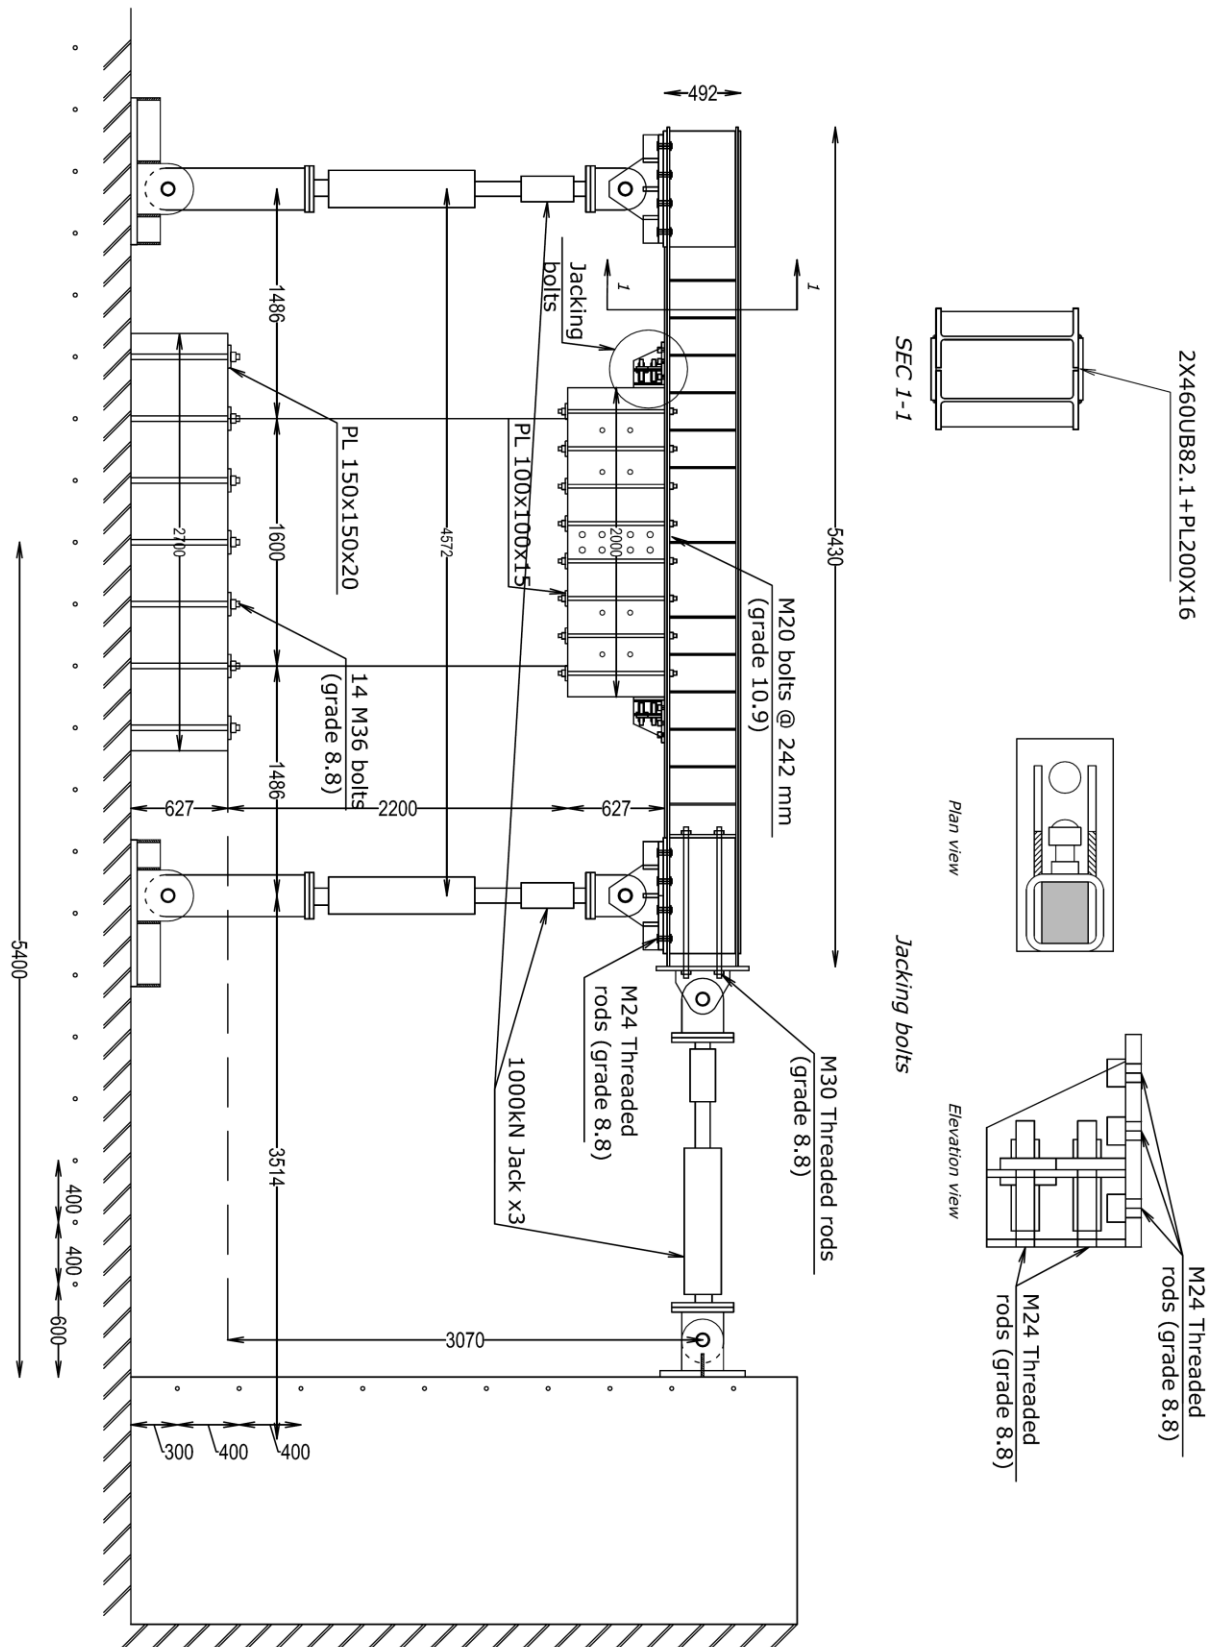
Schematic view of the test setup – in-plane view (front/west view)
